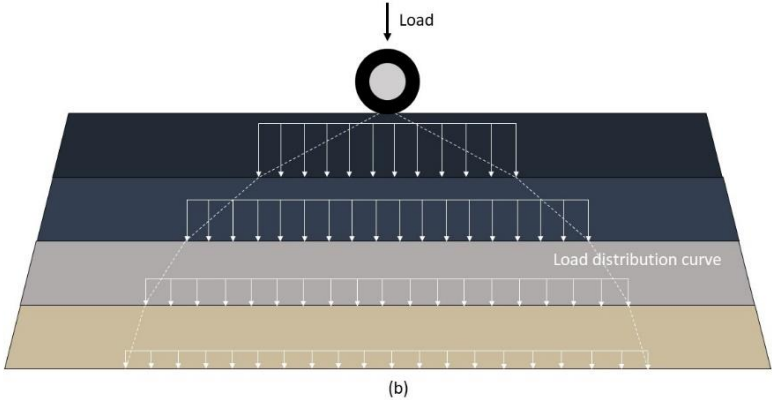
Flexible pavement load distribution (SANRAL, 2019)
